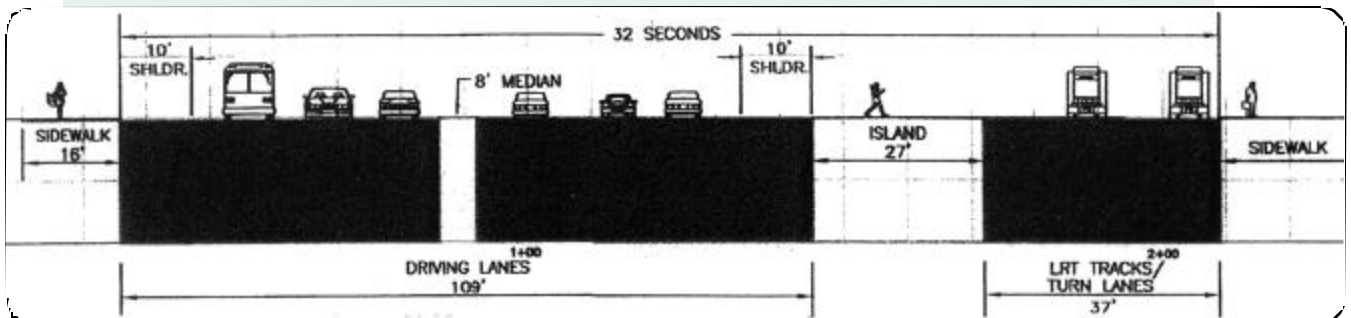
Proposed street section of Hiawatha Avenue just south of 46th Street, facing south.
